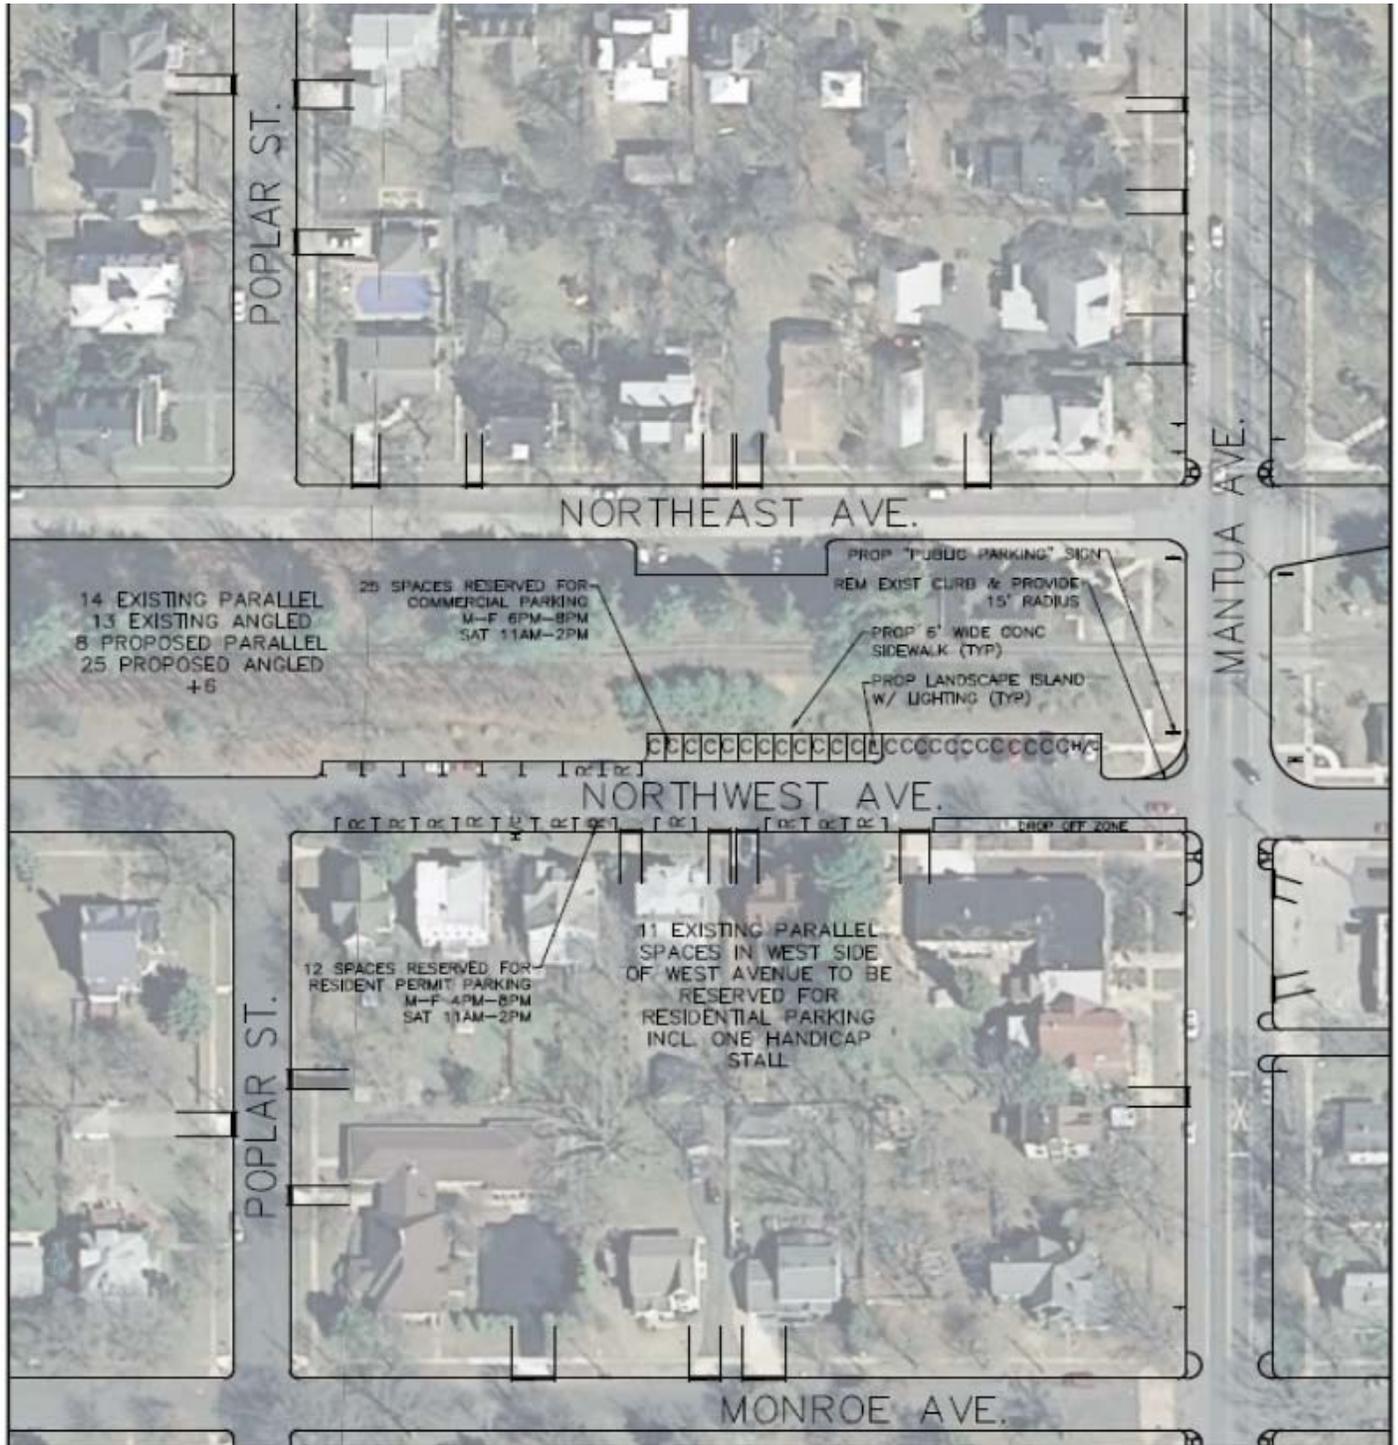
A: NORTHWEST AVENUE PARKING LOT EXPANSION (ALTERNATE)
